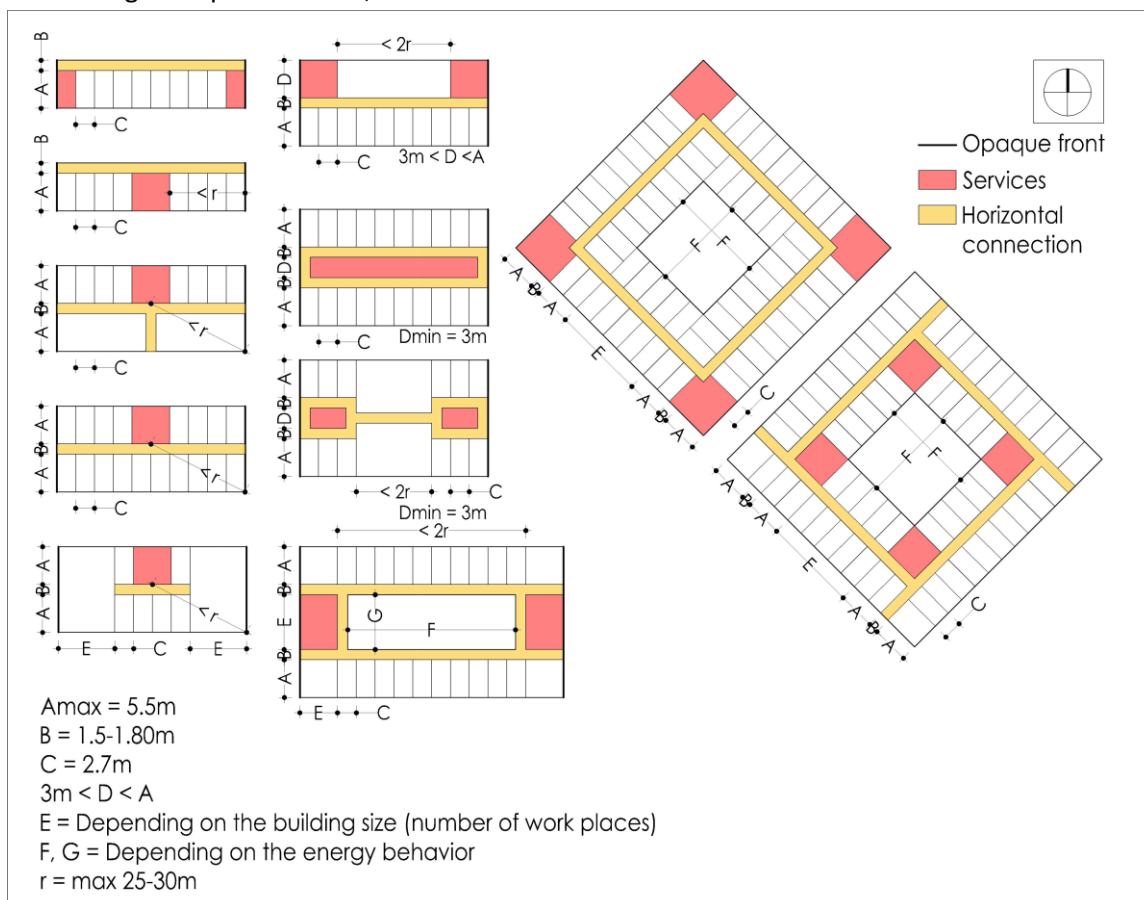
Low-rise buildings with a wide floor plan: internal layout according to the orientation [8]
